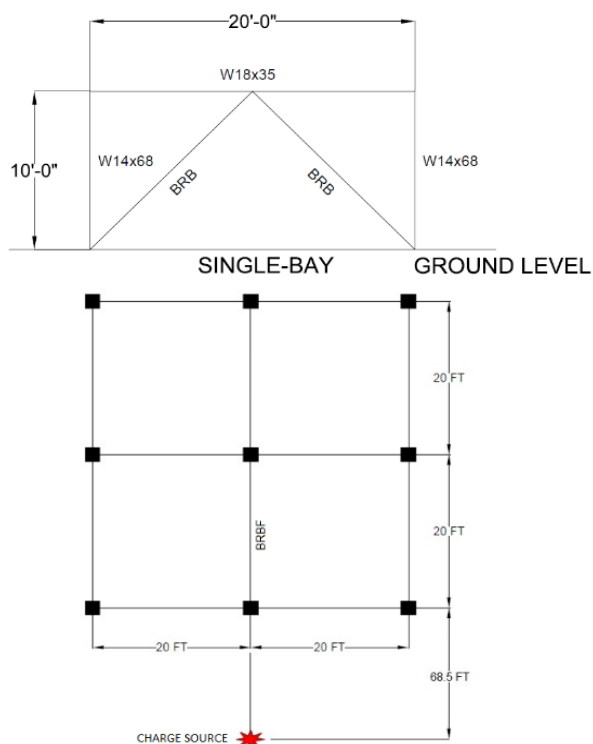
Elevation and plan views of the schematic building with BRBF.
